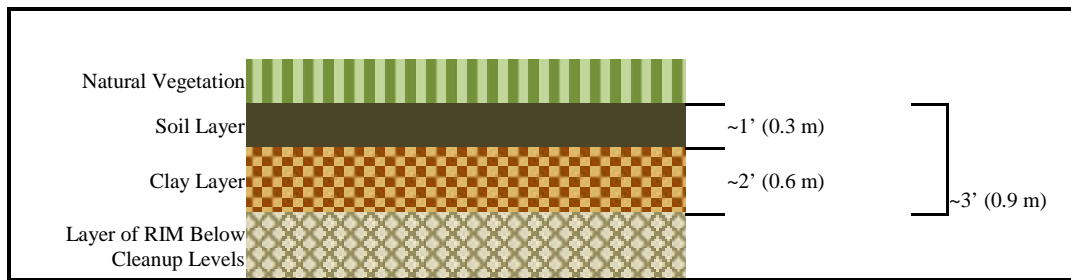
Stylized Cross-Section after RIM Has Been Excavated and Sent for Off-site Disposal
